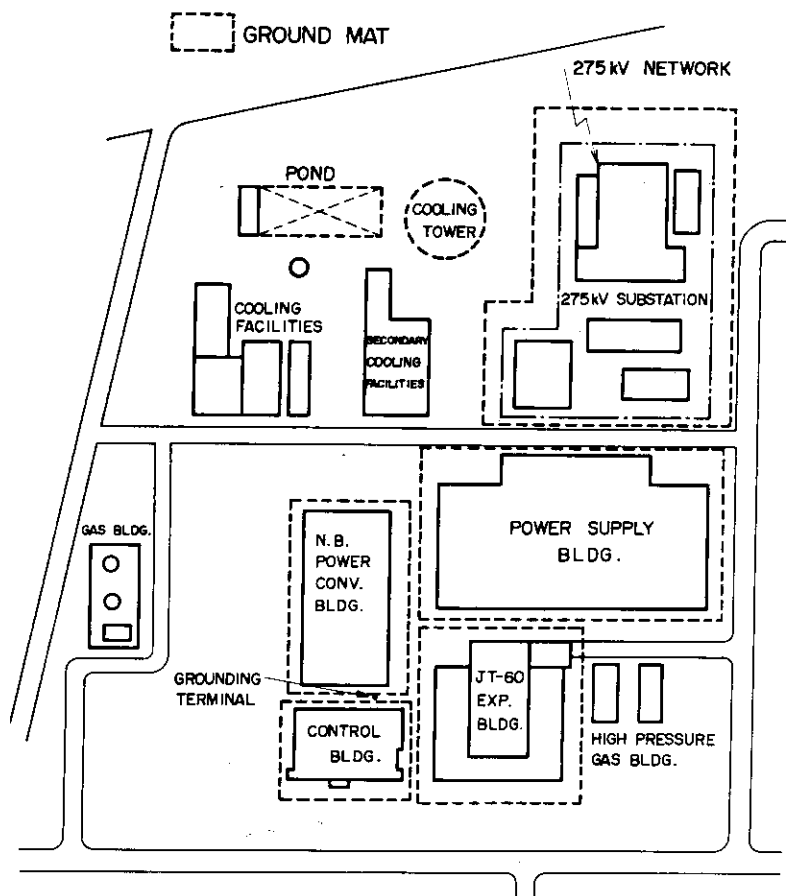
JT-60 site plan and ground mat location
